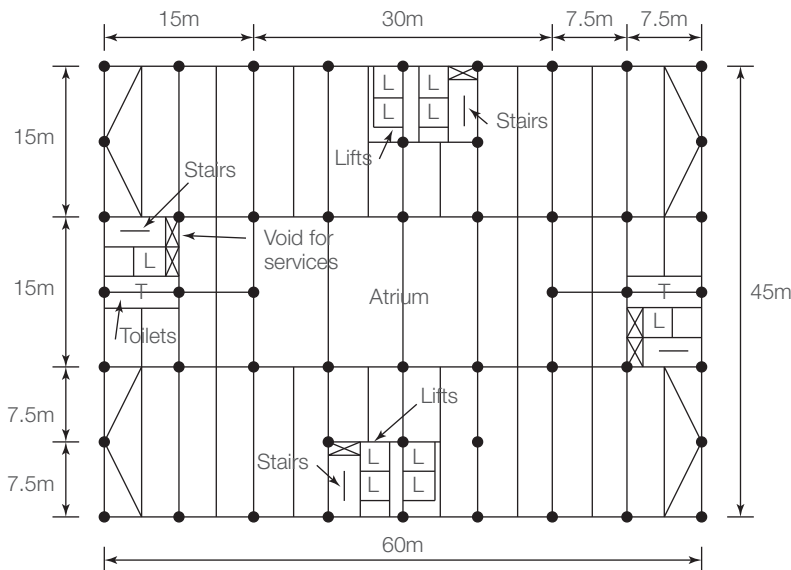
Indicative column layout/grid arrangement for a deep-plan/open-plan steel framed office building with a central atrium
